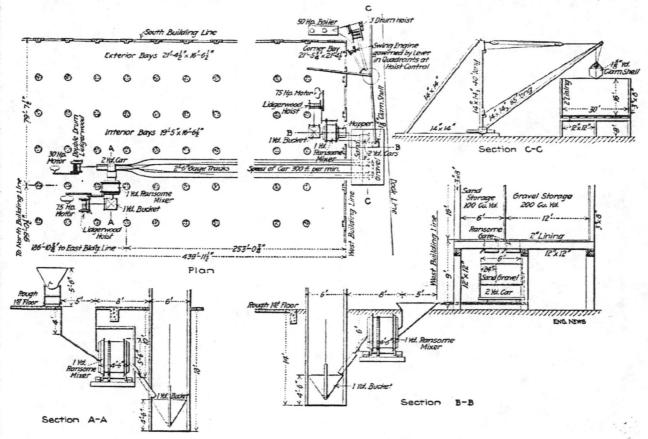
Details of Concreting Plant on Austin-Nichols Building
